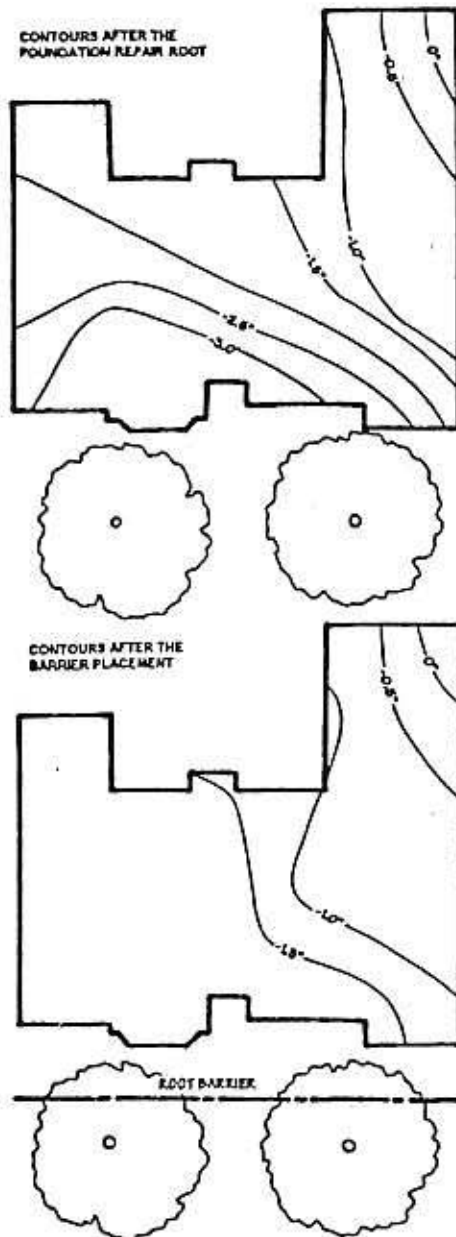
An example of failure of a foundation as a result of the depletion of moisture at the edges because of trees. Measurements were taken after pier installation and after root barrier installation
